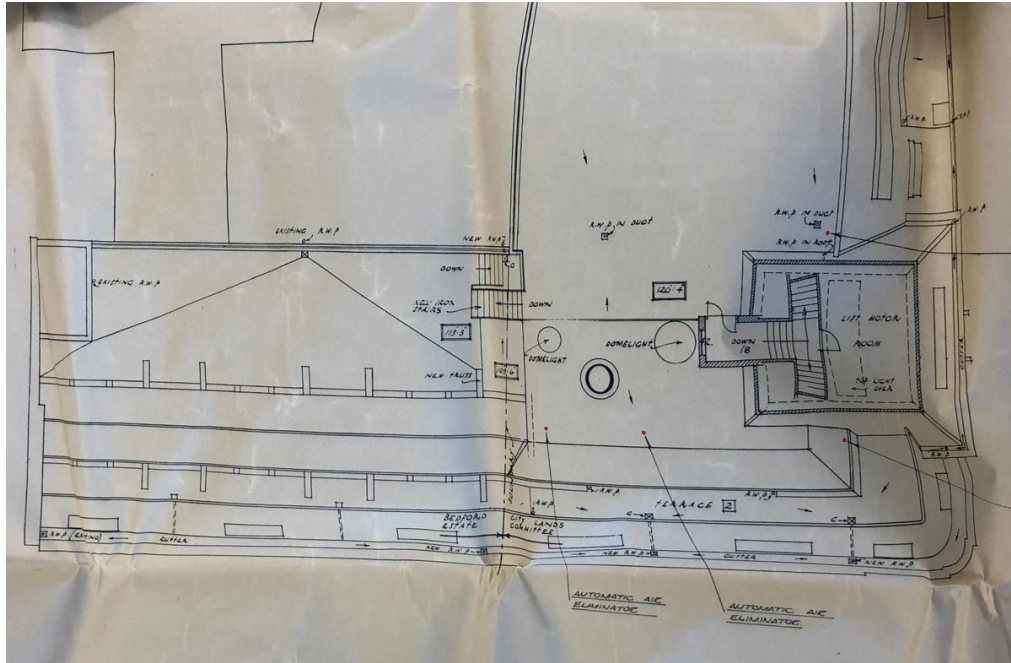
Extract of 1937 Proposed Roof Level (sixth floor) (albeit part of larger proposed extension and redevelopment scheme)⁹
